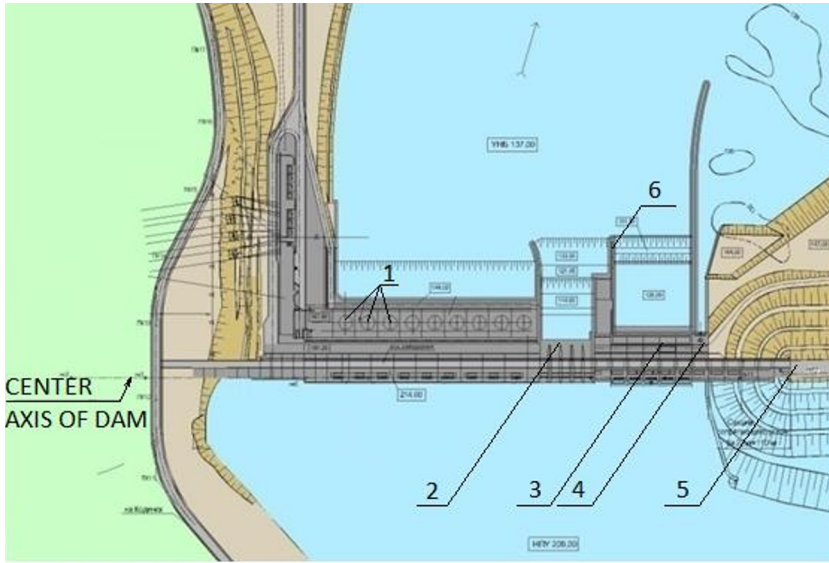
Layout of spillways structures of Boguchansky hydroelectric complex: 1 is hydroelectric power station; 2 is surface spillway No.2; 3 is deep spillway No.1; 4 is timber transmission facility; 5 is ground dam; 6 is separate wall between spillways No.1 and No.2
